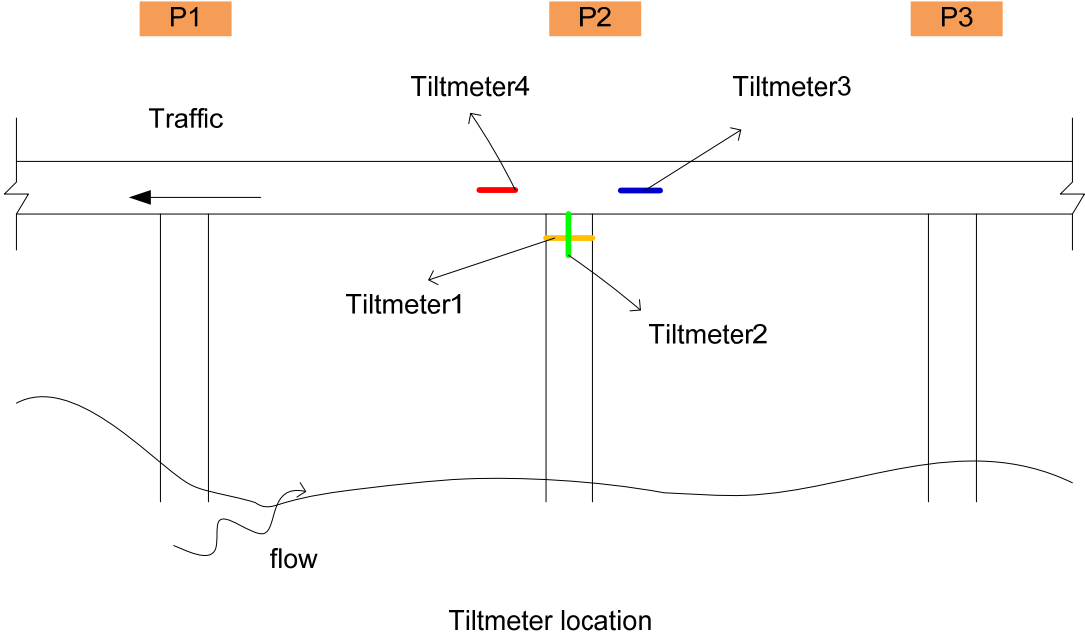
Layout of the Tiltmeter Location on SH80 over San Antonio River Bridge.
